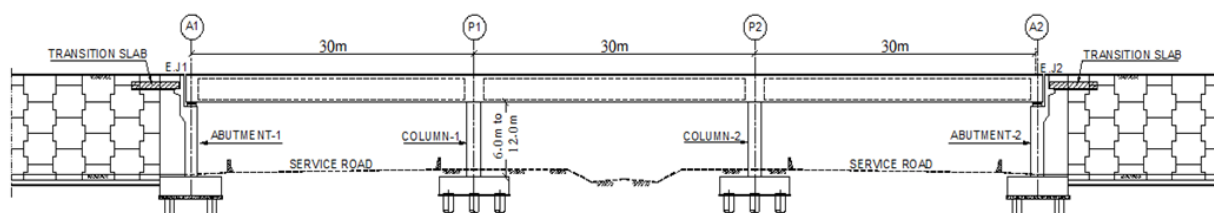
Longitudinal-section of the considered bridge models for hollow-core bridge
